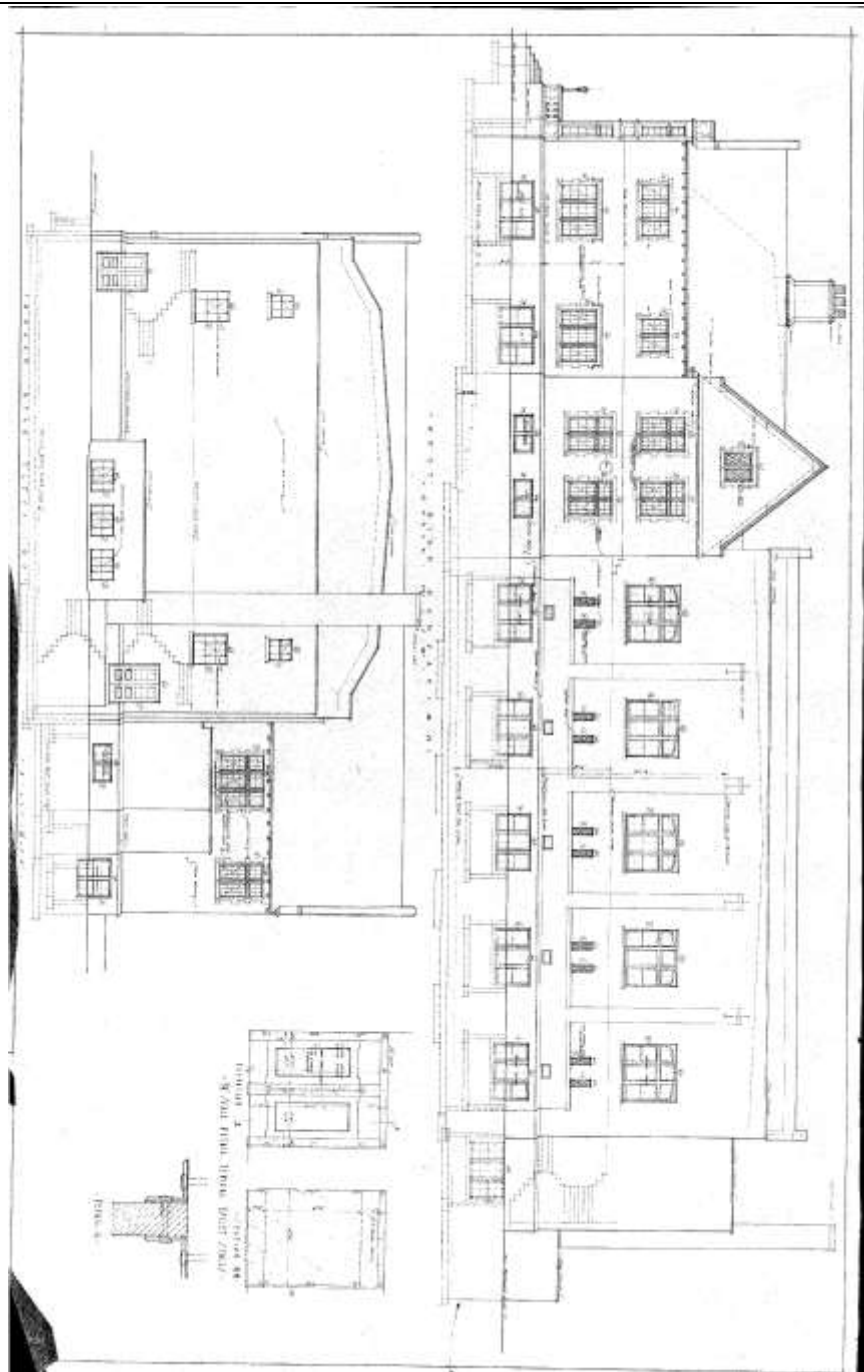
Blueprint of south & west elevation plan by architect Henry Auler
